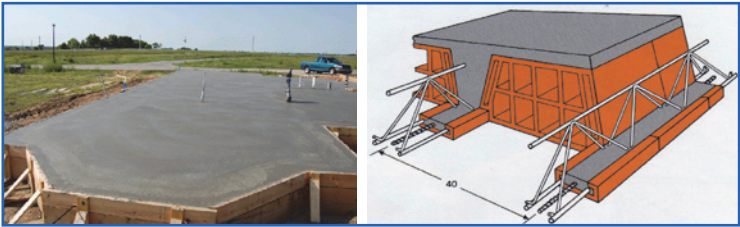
Floor structures: a) solid reinforced concrete slab; b) beam and block floor (semi-prefabricated floor), type “Monta”.
